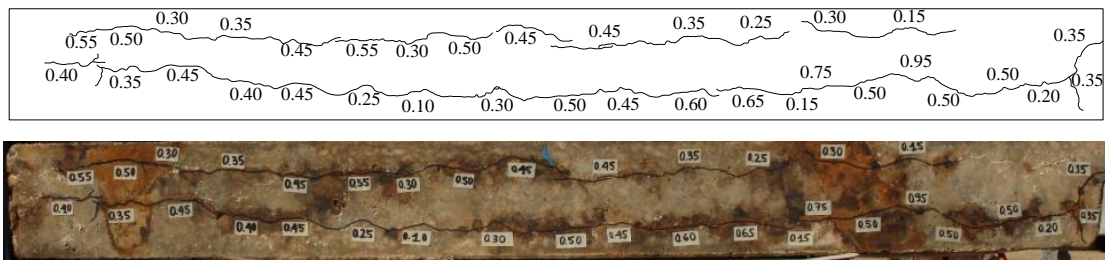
Crack pattern and crack width of NRB beam at the bottom (unit: mm)
